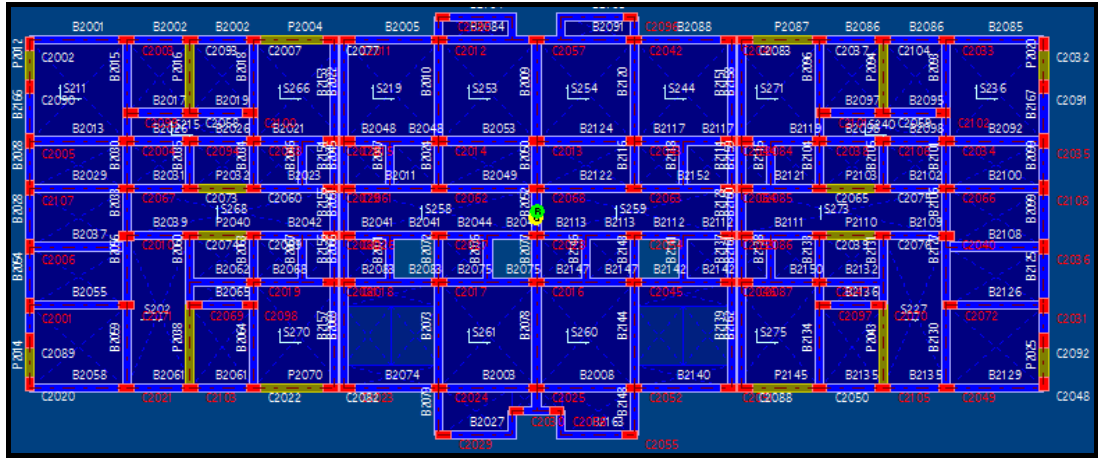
Plan of Twenty Stories and Shear Wall System
